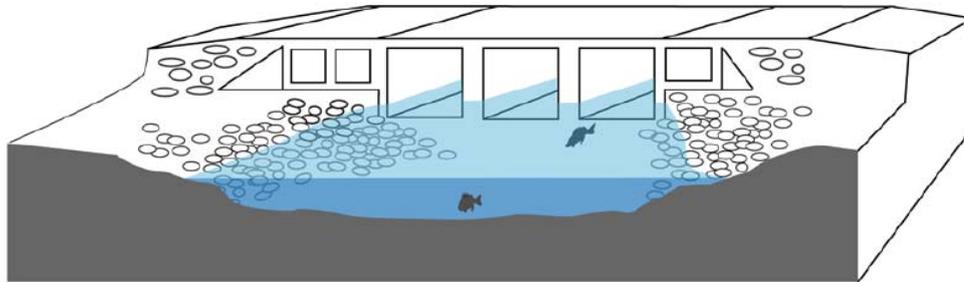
Conceptual road crossing facilitating fish passage (NSW Office of Water 2012)
